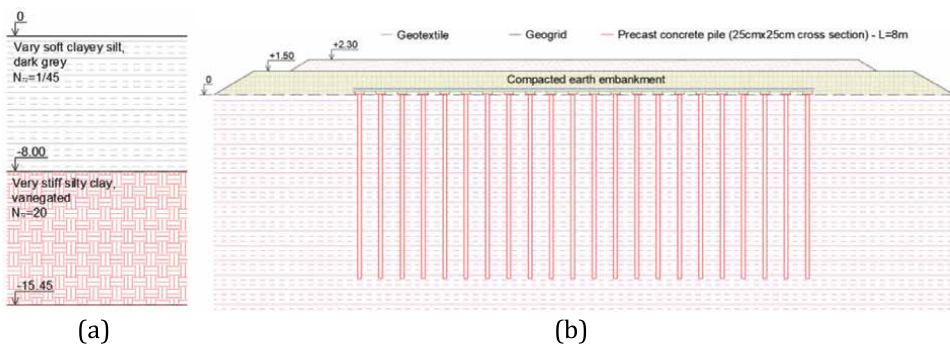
Connection road to state highway PA-150, state of Pará. a) Stratigraphic profile; b) arrangement of the piles and the geogrid reinforcement, in cross-section.
